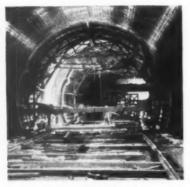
Steel reinforcement and inner steel form for units of the Alameda Estuary Tube, Oakland, Calif.
